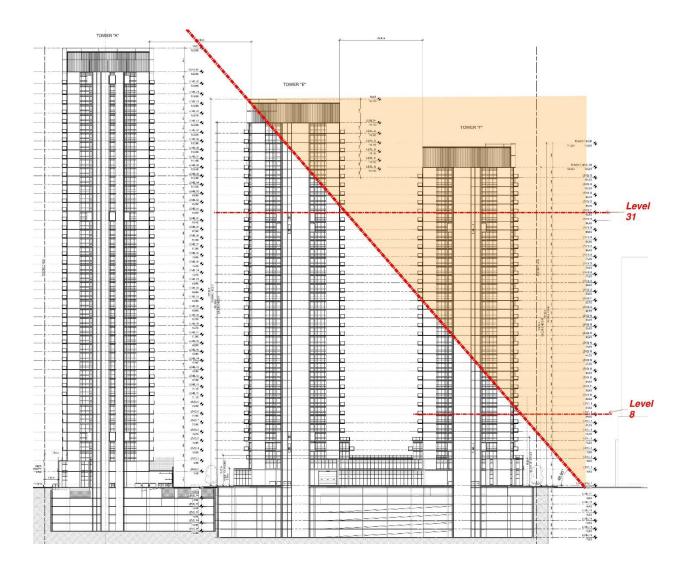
Section through lot 1 and 3, Towers A, E, and F, refer to RZ-20 for Section Details
